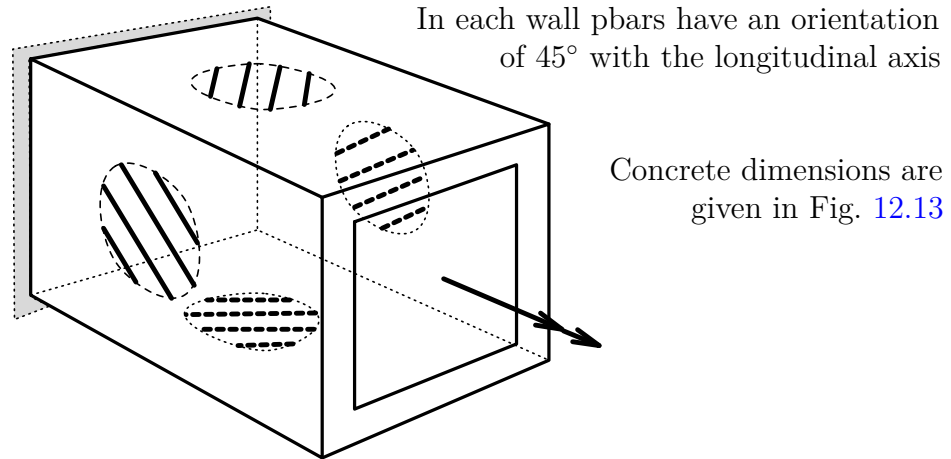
Arrangement of Pbars in Twisted Box Beam
